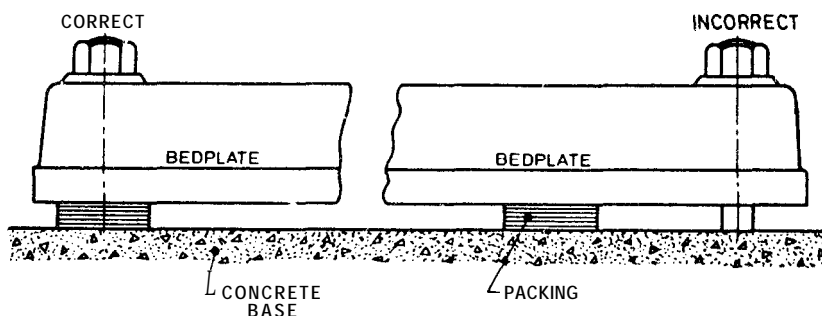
PACKING AND BED PLATE FOR GROUTING
